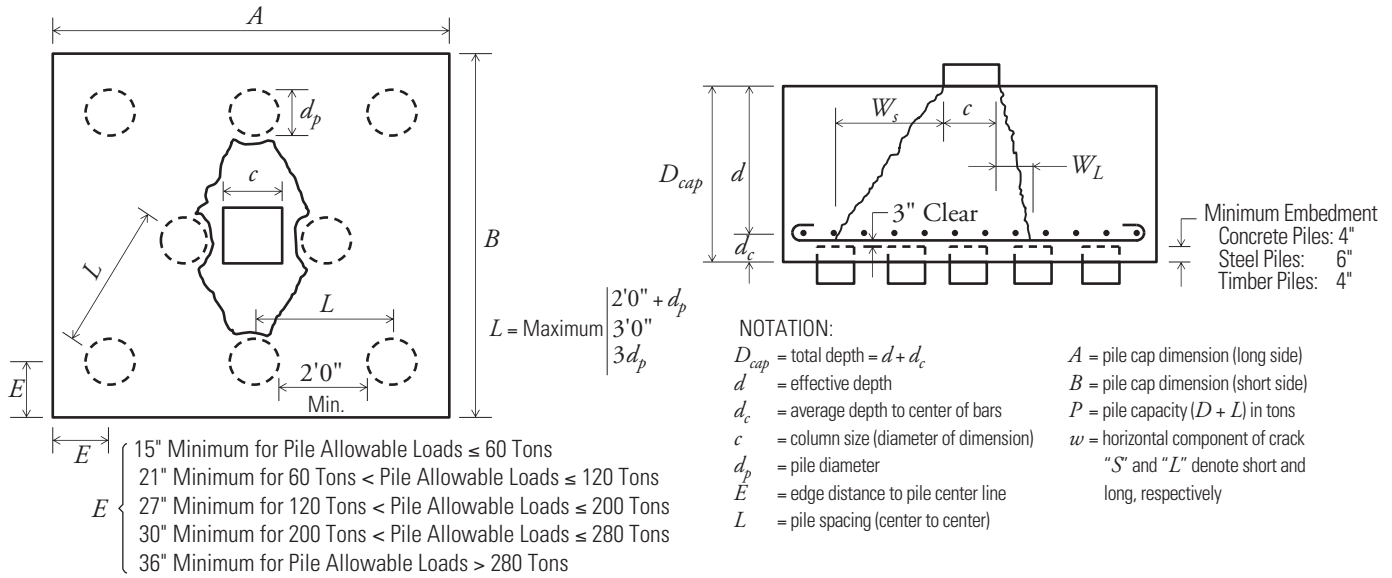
Typical pile cap nomenclature, dimensions, and section details.
